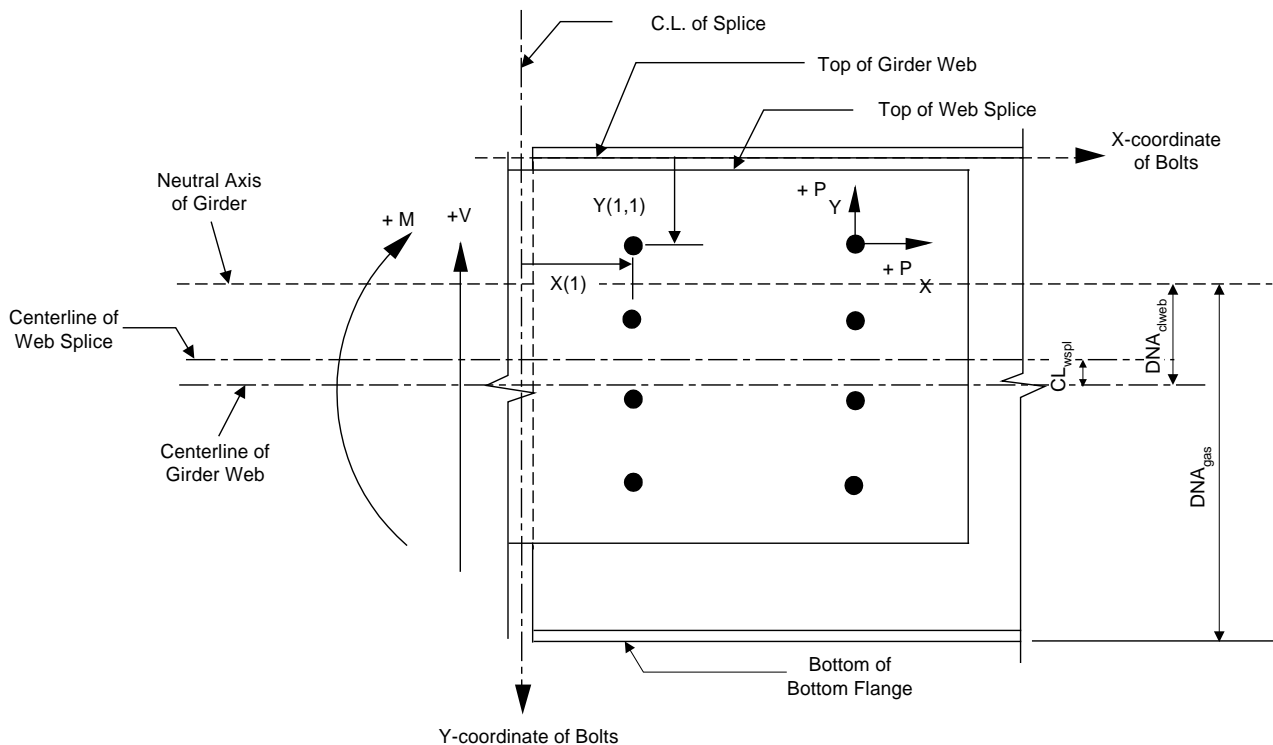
Adjacent Girder Section on Right Side of Splice Centerline and Sign Convention
